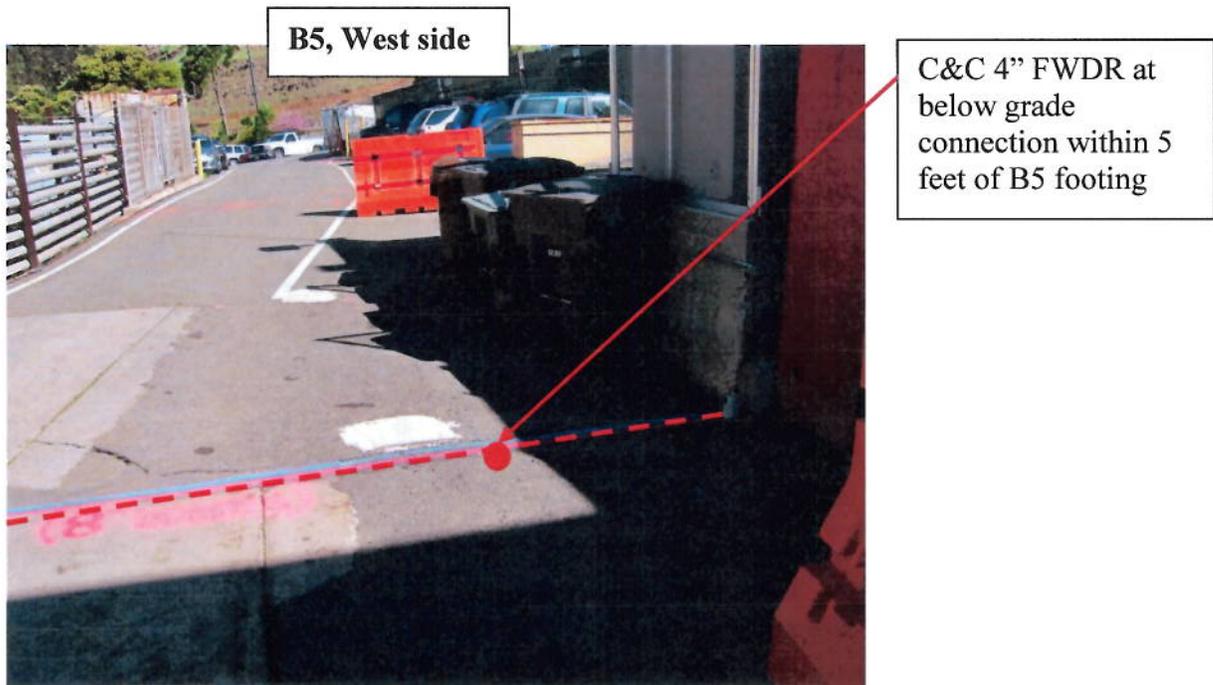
Weep Drain from B5 to B16 retaining wall
